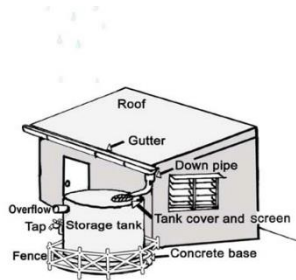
A typical Roof top Rainwater Harvesting System [6].
